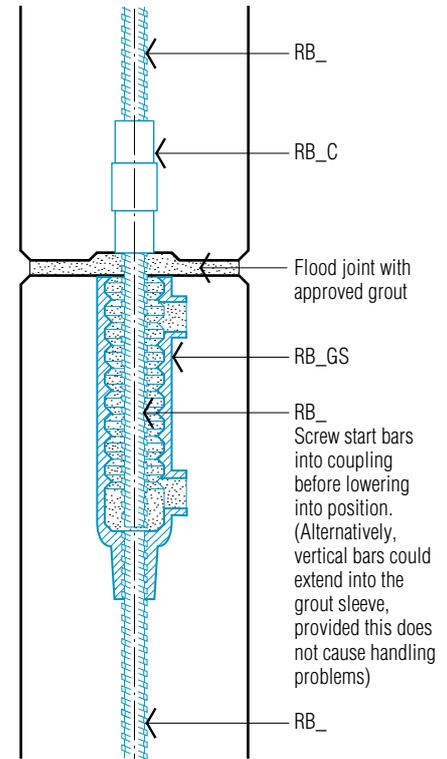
HORIZONTAL JOINT – PRECAST LOADBEARING WALL PANELS
